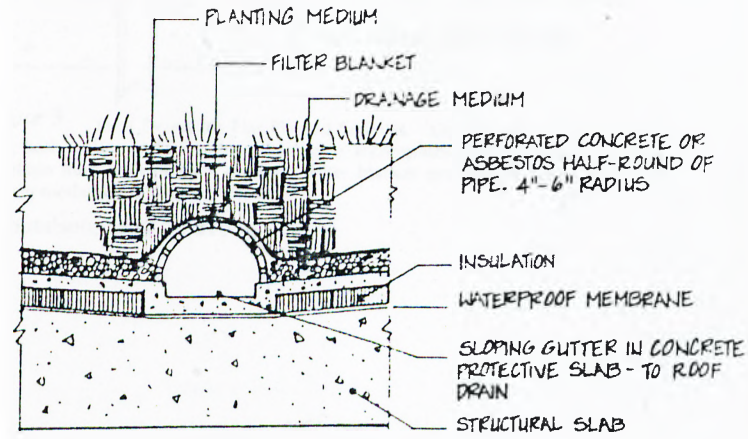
Half-Round Drainage Channel under Planting. A sloping drainage channel formed in the concrete protective slab is covered with half-round perforated pipe in 2- to 3-ft (0.6 to 0.9m) lengths and a filter blanket.
